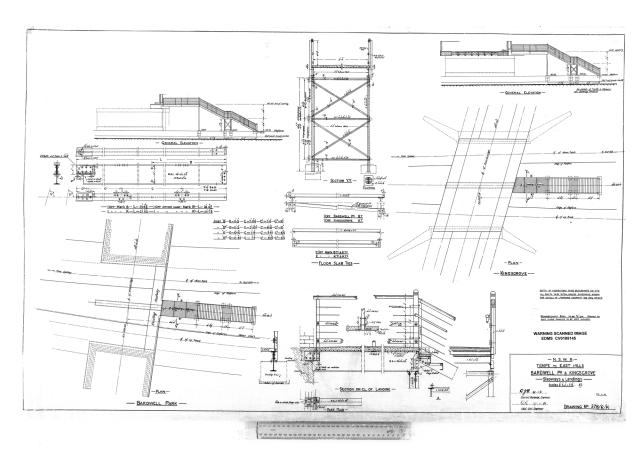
Bardwell Park entry stair structure, 1931 (Virtual Plan Room)
